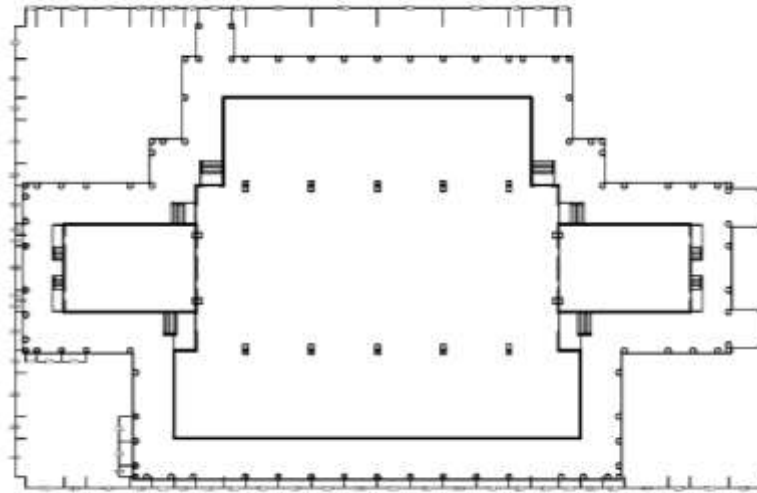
Floor Plan of Aula Barat, Bandung Institute of Technology
